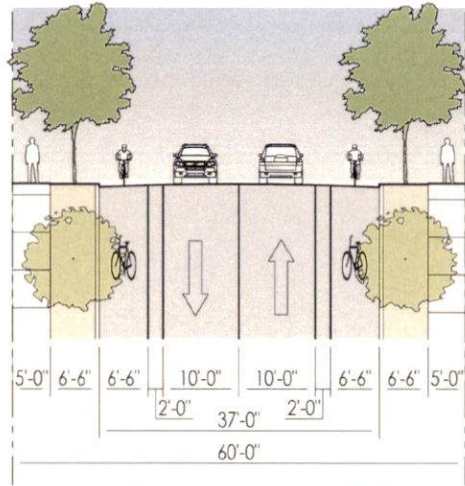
EXHIBIT L - DEPICTION OF SUBDIVISION STREET SECTIONS
